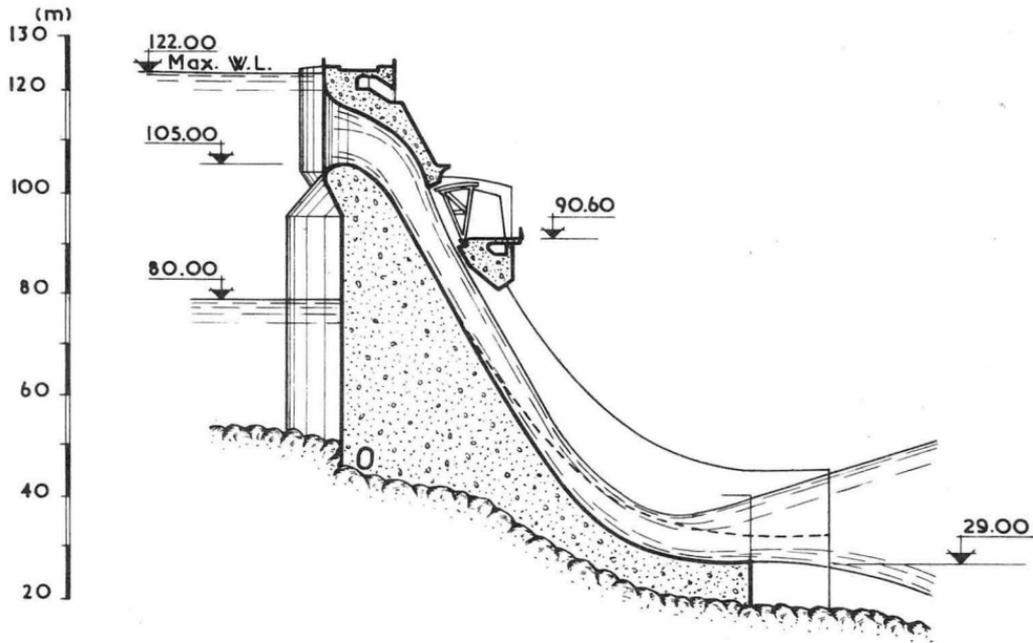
CASTELO DO BODE - SECTION THROUGH THE RIGHT SPILLWAY CHANNEL (R)
